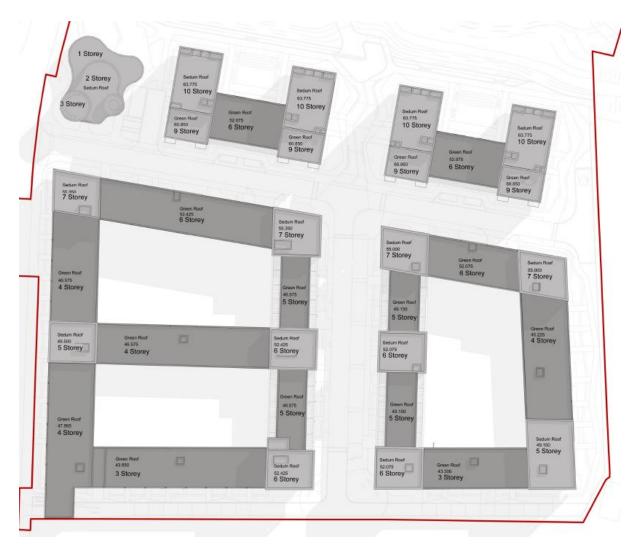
PROPOSED DEVELOPMENT SCHEME - BLOCK PLAN LAYOUT WITH HEIGHTS AND STOREYS, PLUS ARCHITECTS
